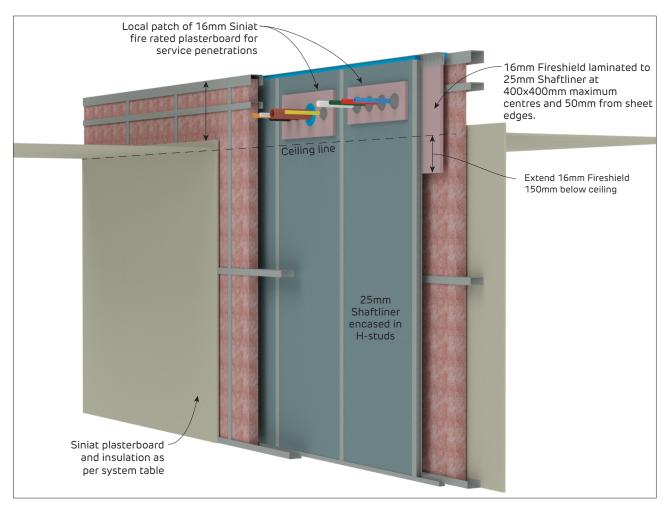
Penetrations Through Central Fire Barrier Along Ceiling CavityPerspective
